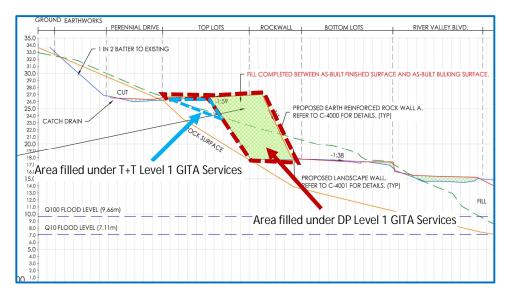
Extract from CJ Arms drawing sectional view of areas supervised by Chadwick Geotechnics and DP
